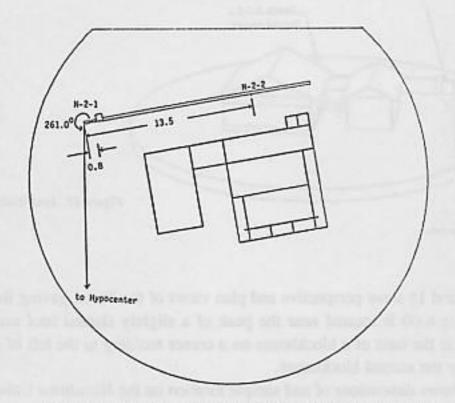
Plan view of Ieno Wall, house, and shed. Dimensions in meters
